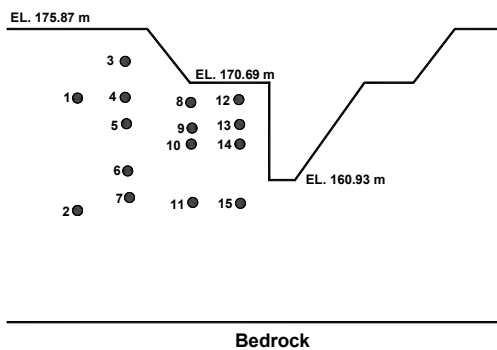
Excavation profile and location of piezometers (after Kwan 1971)
